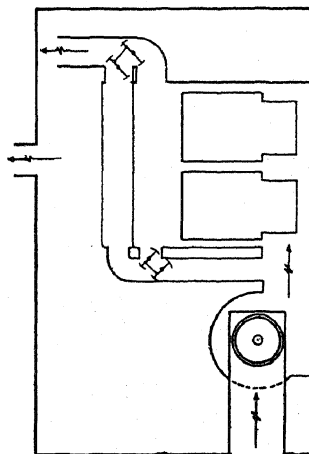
HEATER ARRANGED FOR OUTSIDE AIR WITH WARM AIR CONNECTION TO FAN INLET TO TEMPER AIR, ALSO MIXING DAMPERS FROM WARM AIR AND TEMPERED AIR CHAMBER
